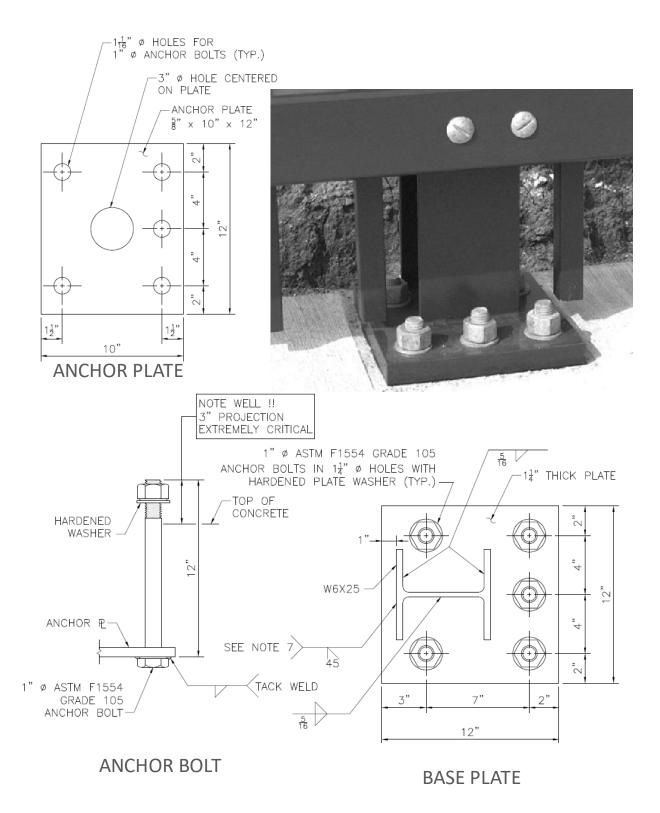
Anchor assembly for the S3-TL4 bridge rail posts.
